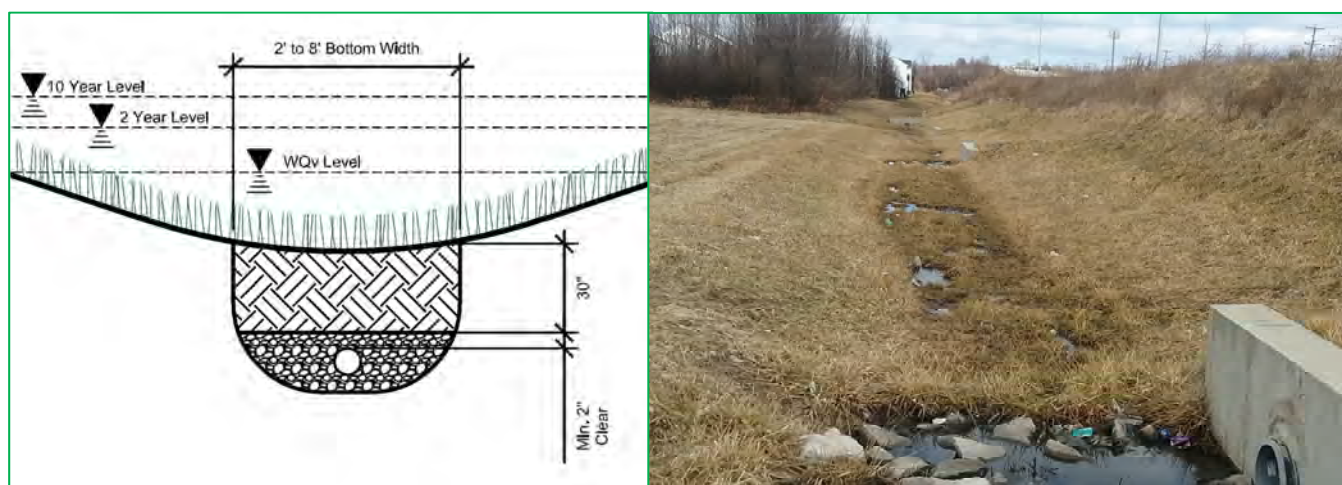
TYPICAL SWALE DESIGN PLAN VIEW (LEFT) AND TYPICAL SWALE INSTALLATION (RIGHT)
